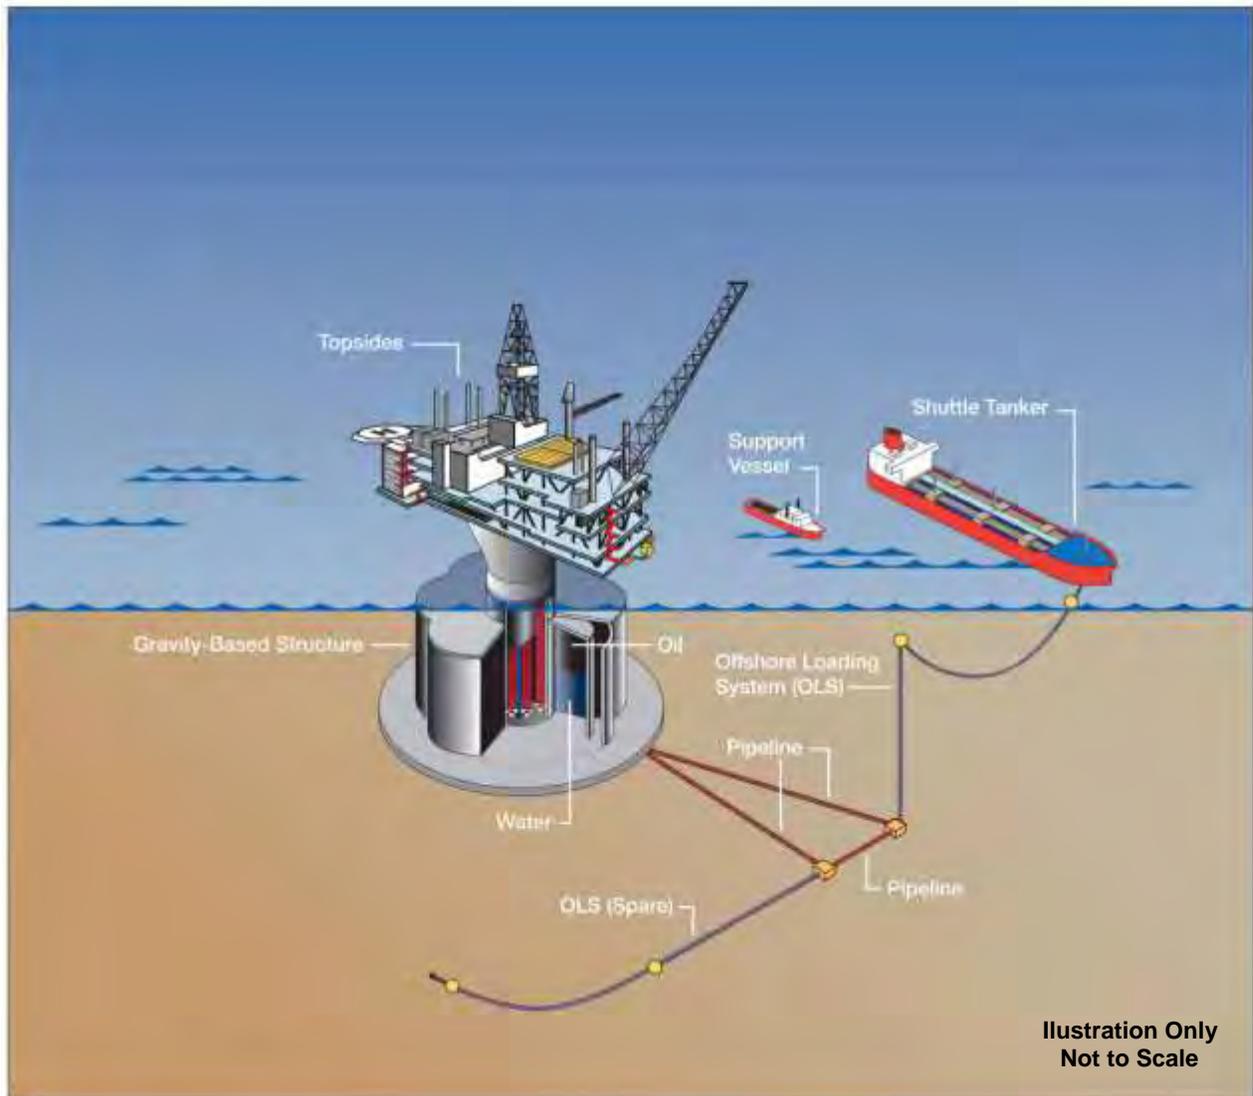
Stand-alone Gravity Base Structure Preliminary Development Layout
